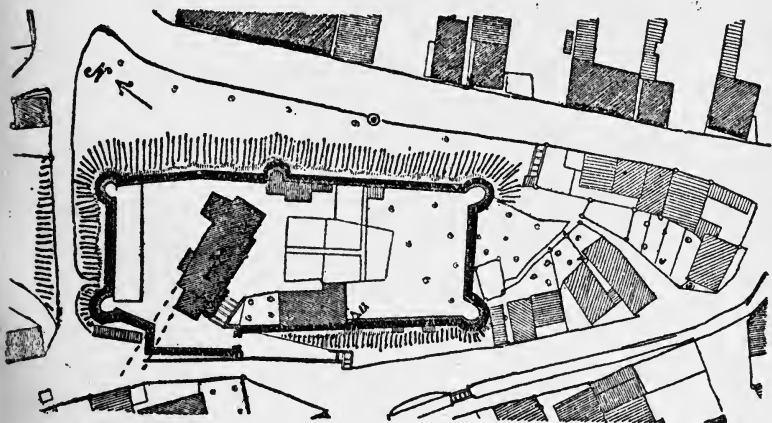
Plan of Church and Churchyard, Walldorf.
